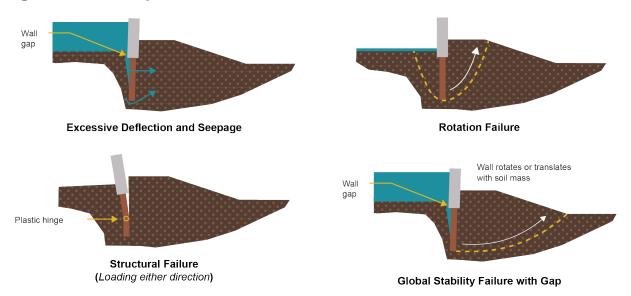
Sheetpile Wall Failure Modes
